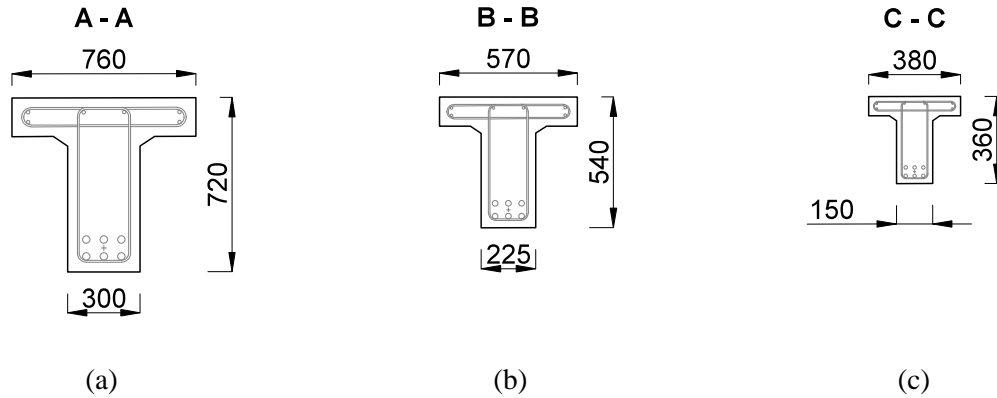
Scaling of T-beam specimens – section through: (a) large T-beam (Bath), (b) medium T-beam (Bath and Cambridge) and (c) small T-beam (Cambridge) [mm].
